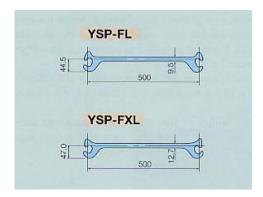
Straight web-type sheet piles used for the shell of the cellular structure
